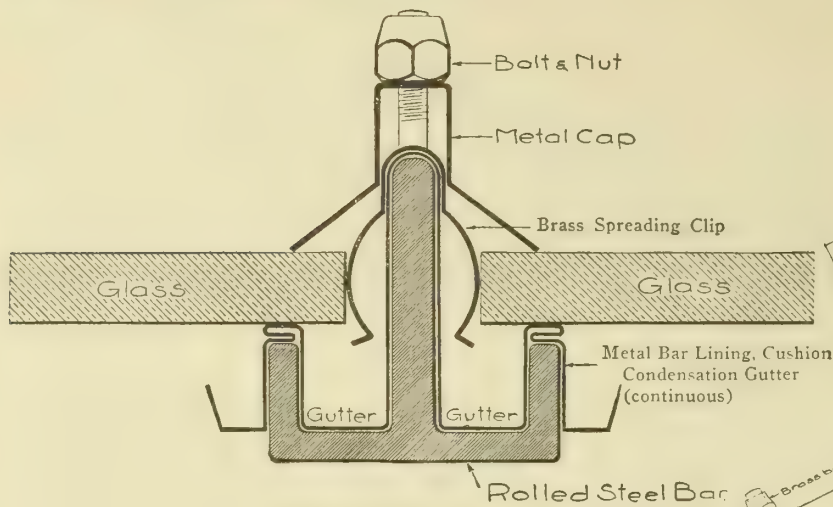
FULL-SIZED TRANSVERSE SECTION AT SKYLIGHT SUPPORTING BAR
